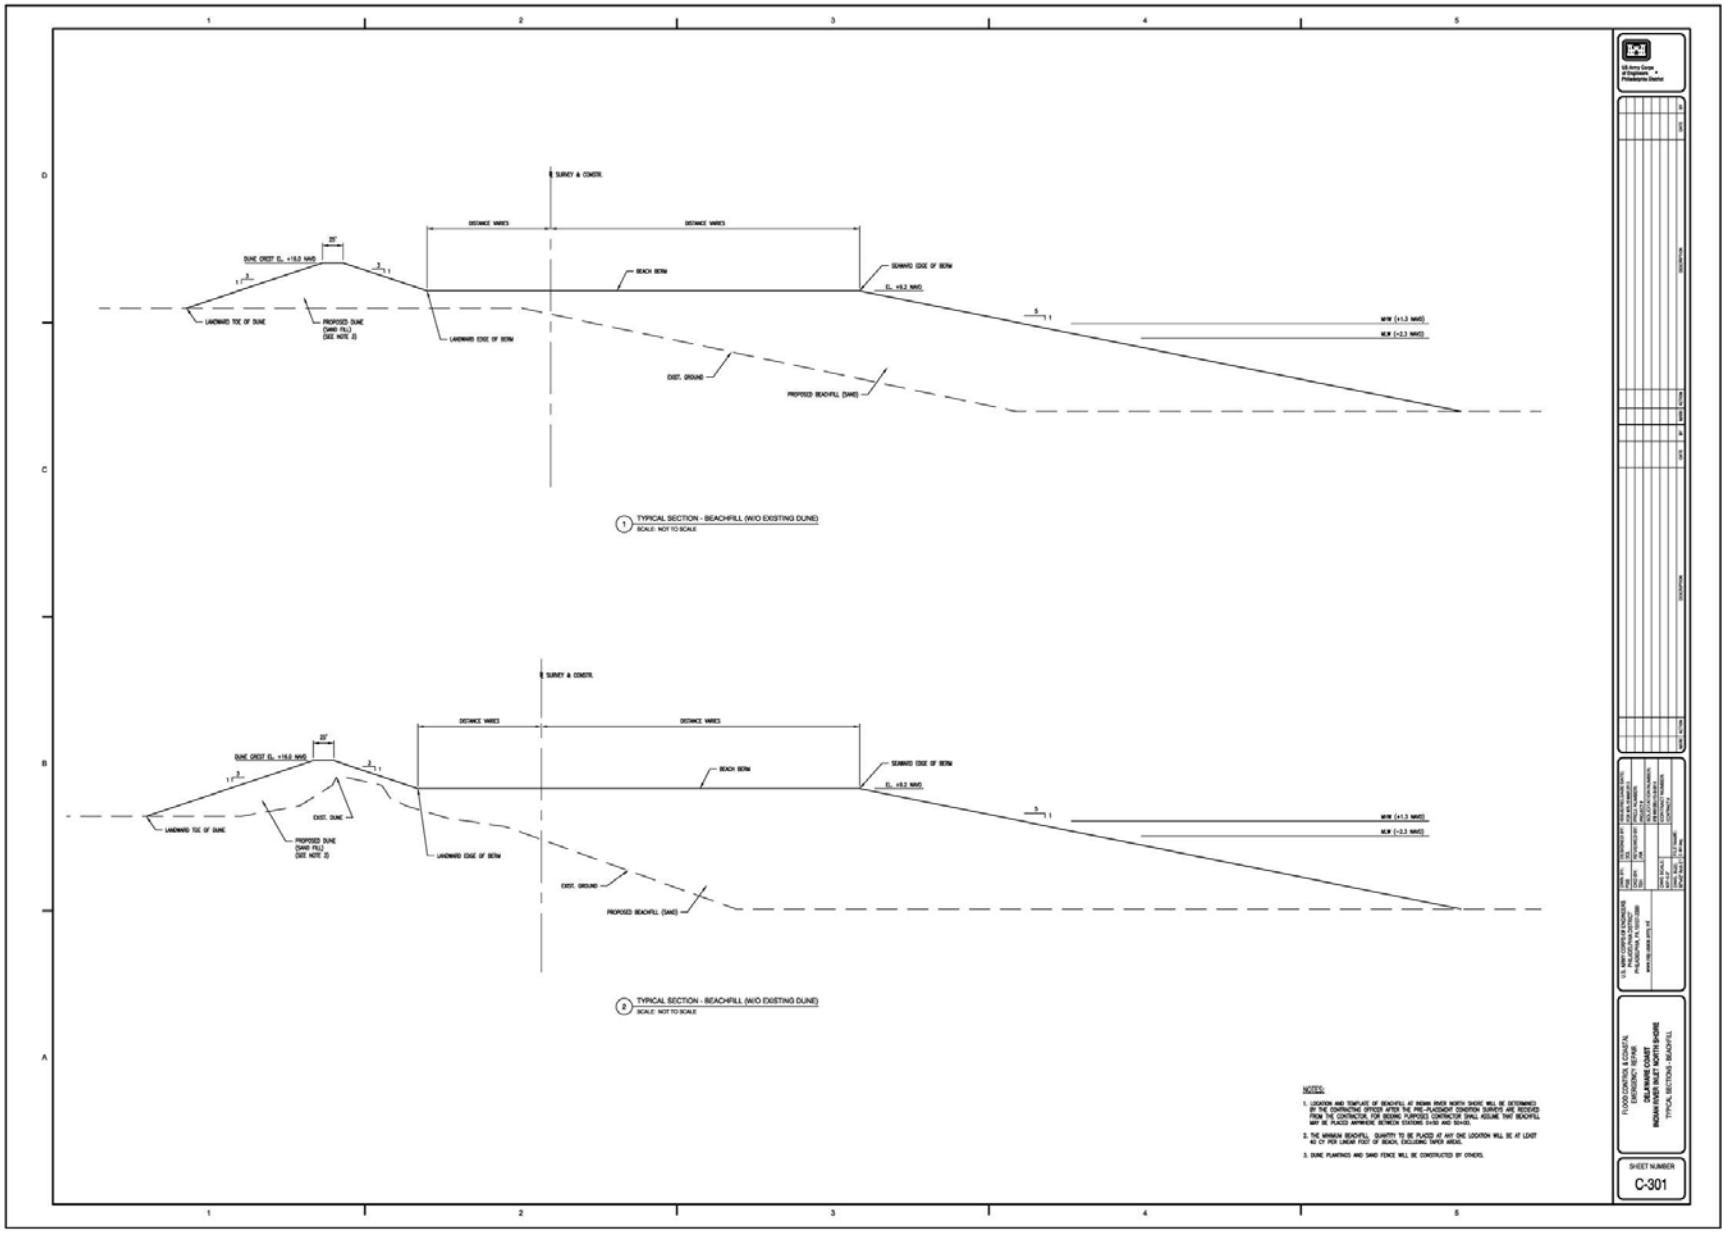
Indian River Inlet North Shore Beachfill (Typical Cross Section)
